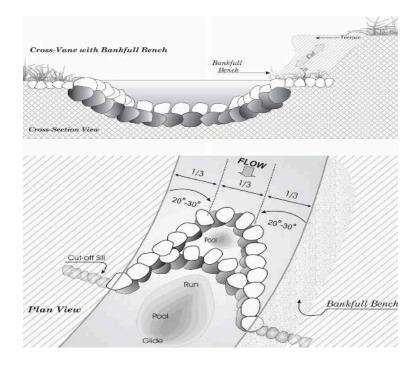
Excavated Bankfull Bench for a Restoration Structure (Rosgen, 2006).
